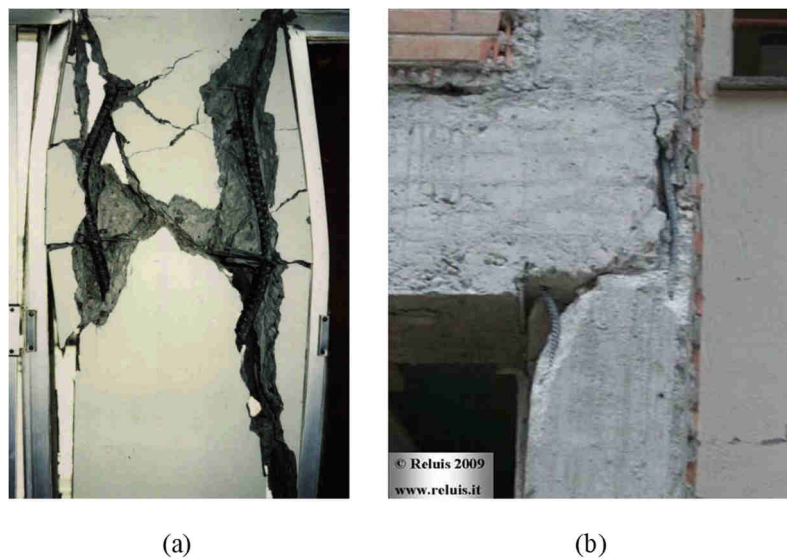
(a) Shear failure of columns and subsequent buckling of vertical reinforcement between the ties, (Comartin et al., 2004); (b) shear failure in beam-column joint (Verderame et al., 2009).
